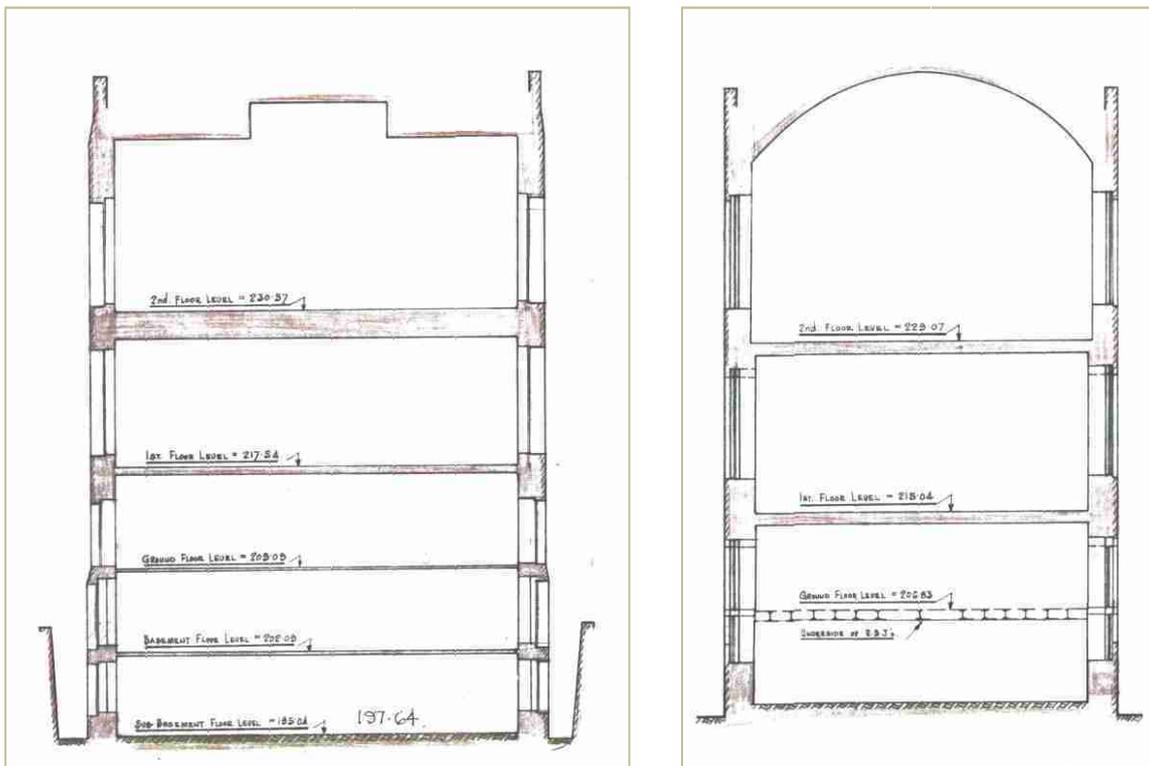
15.1, left, section through the Worthington wing c.1970, showing original stack levels. 15.2, right, section through the Jackson wing c.1970 showing the original floor heights and the projected level of the extant ground floor
